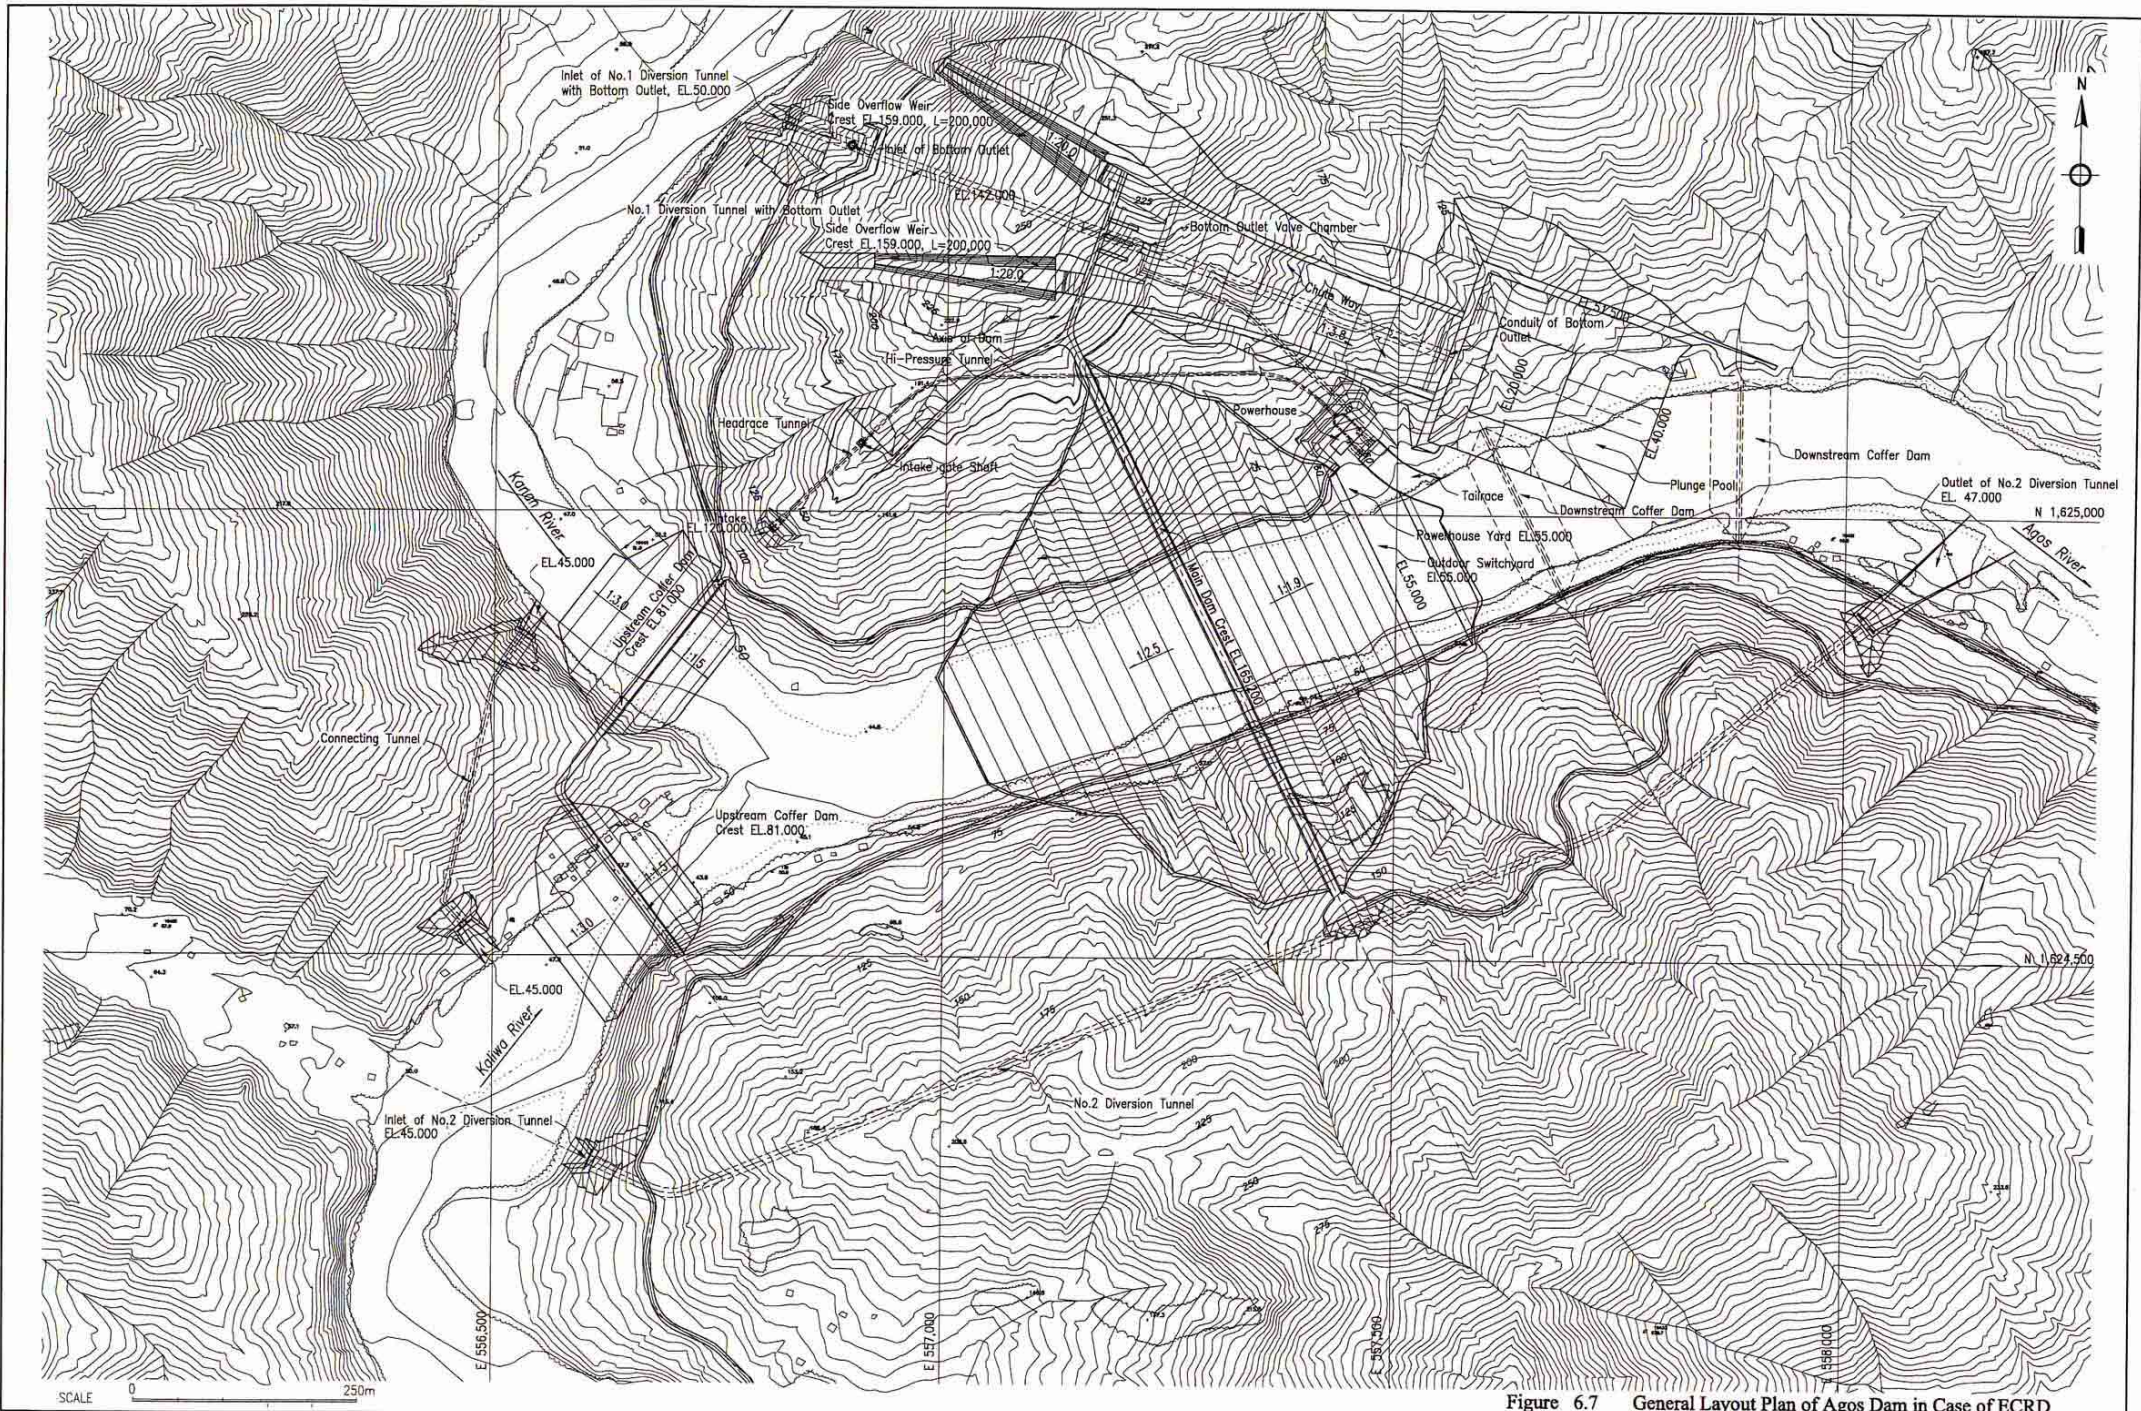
General Layout Plan of Agos Dam in Case of ECRD
